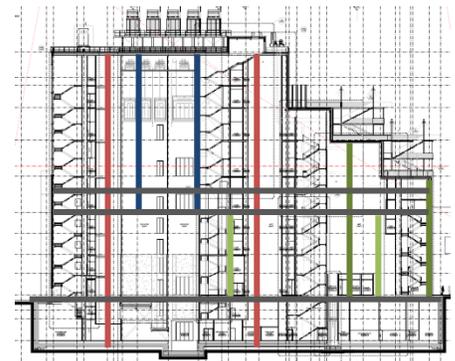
Section cut showing N-S braced frames at staggered heights (A-212)
